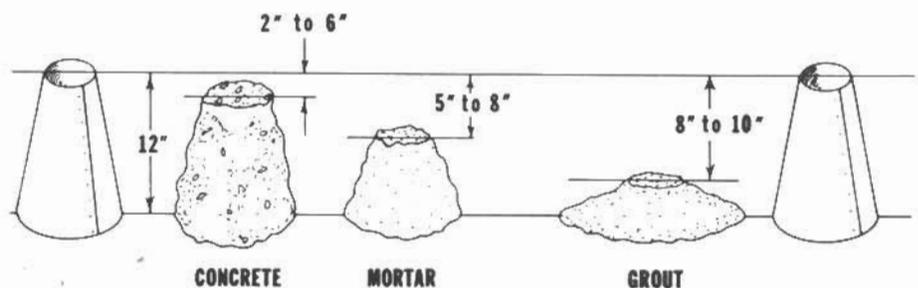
Slump Tests of Concrete, Mortar and Grout.
